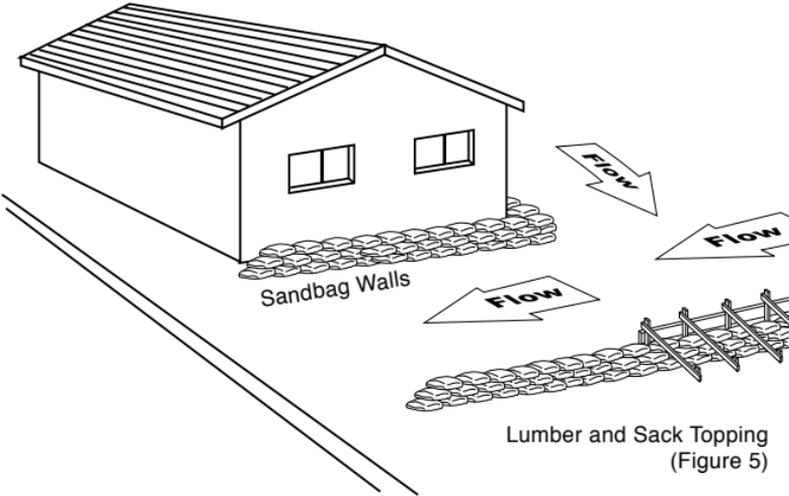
To divert mud, debris, and water, use sandbag walls or lumber and sack topping
